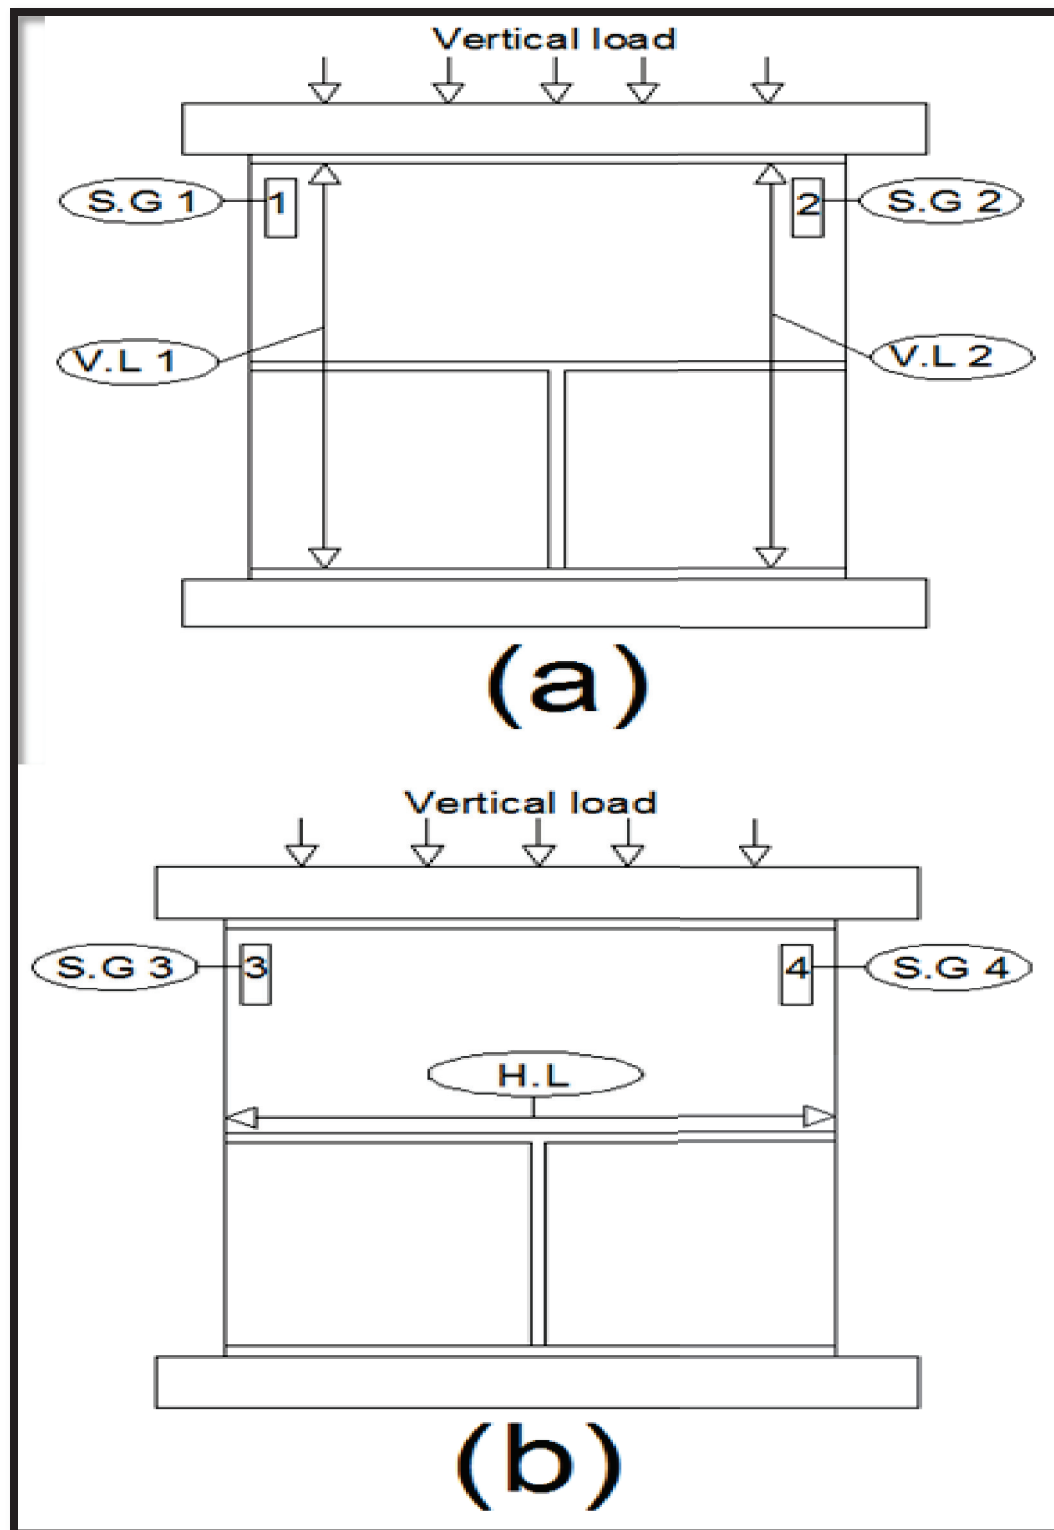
Details of the instrumentation setup: (a) Front face of the specimen; (b) Back face of the specimen
